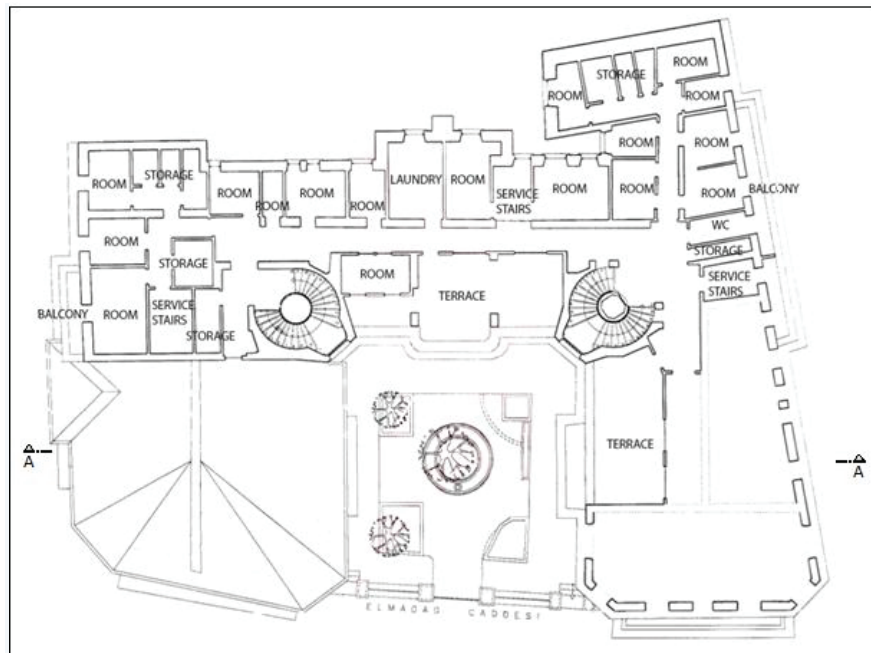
Last floor plan of Arif Pasha Apartment ( Source: Öğrenci 1998)
